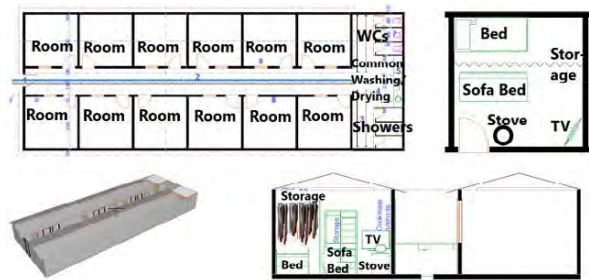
Block of informal one-storey single-room dwellings at Mukuru kwa Ruben informal settlement in plan, section and perspective view.
